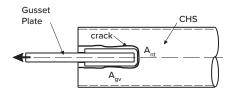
GUSSET PLATE CONNECTION DEFINED IN CIDECT DESIGN GUIDE [2]
